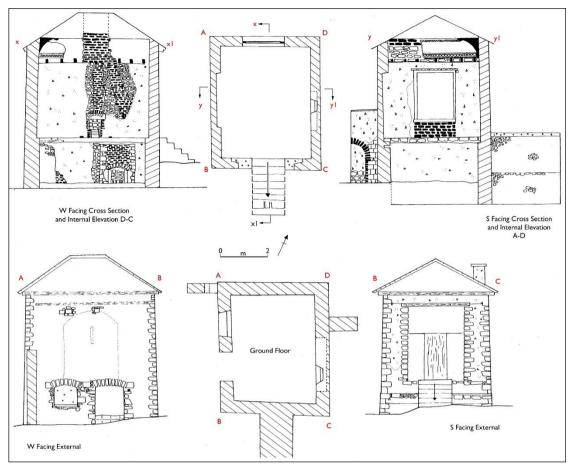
Plan, section, and elevations of Pleasure House (courtesy of Margaret Gowen & Co. Ltd.) excavated under License 01E0555.
